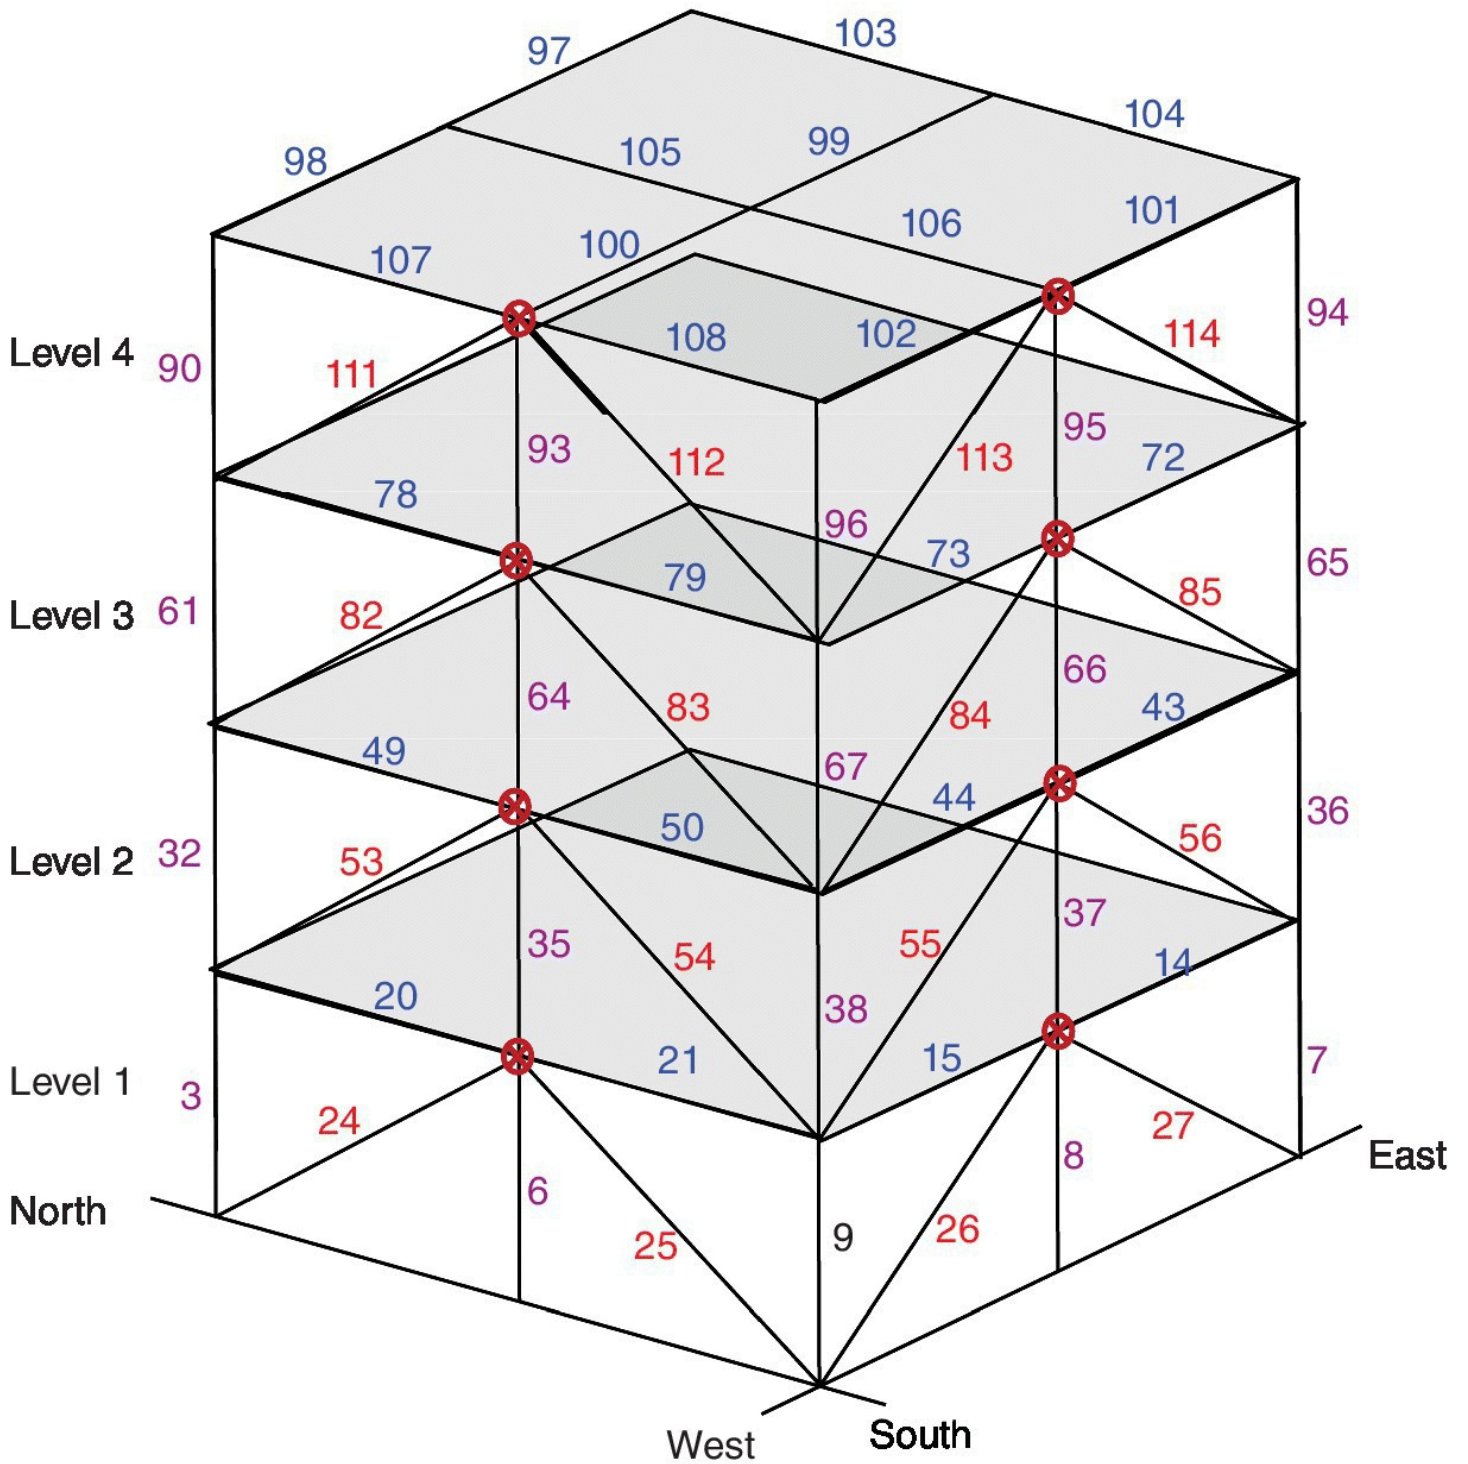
Finite element model of the framed building structure with element numbering and sensor locations (marked with ⊗).
